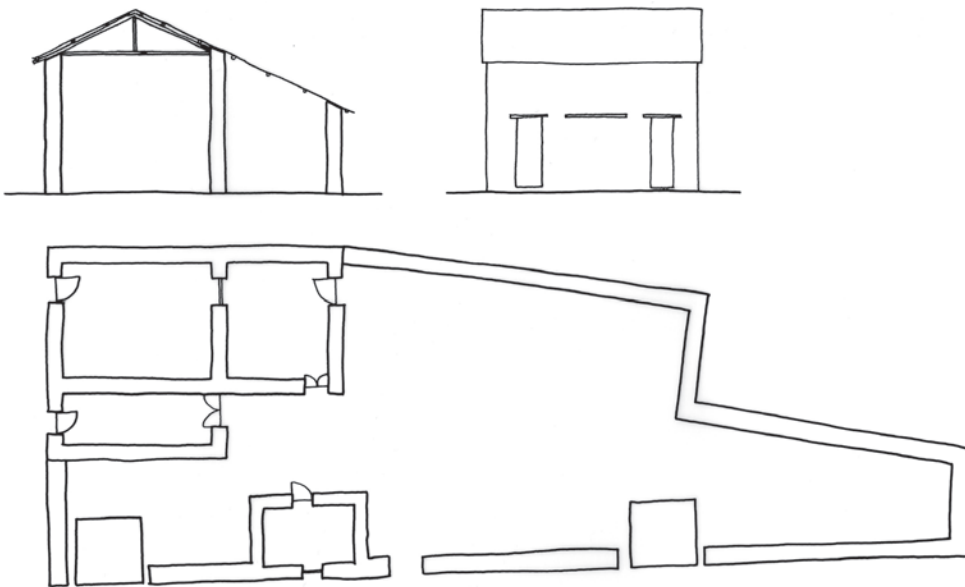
House Kiros Girmay, section and plan, 2009
